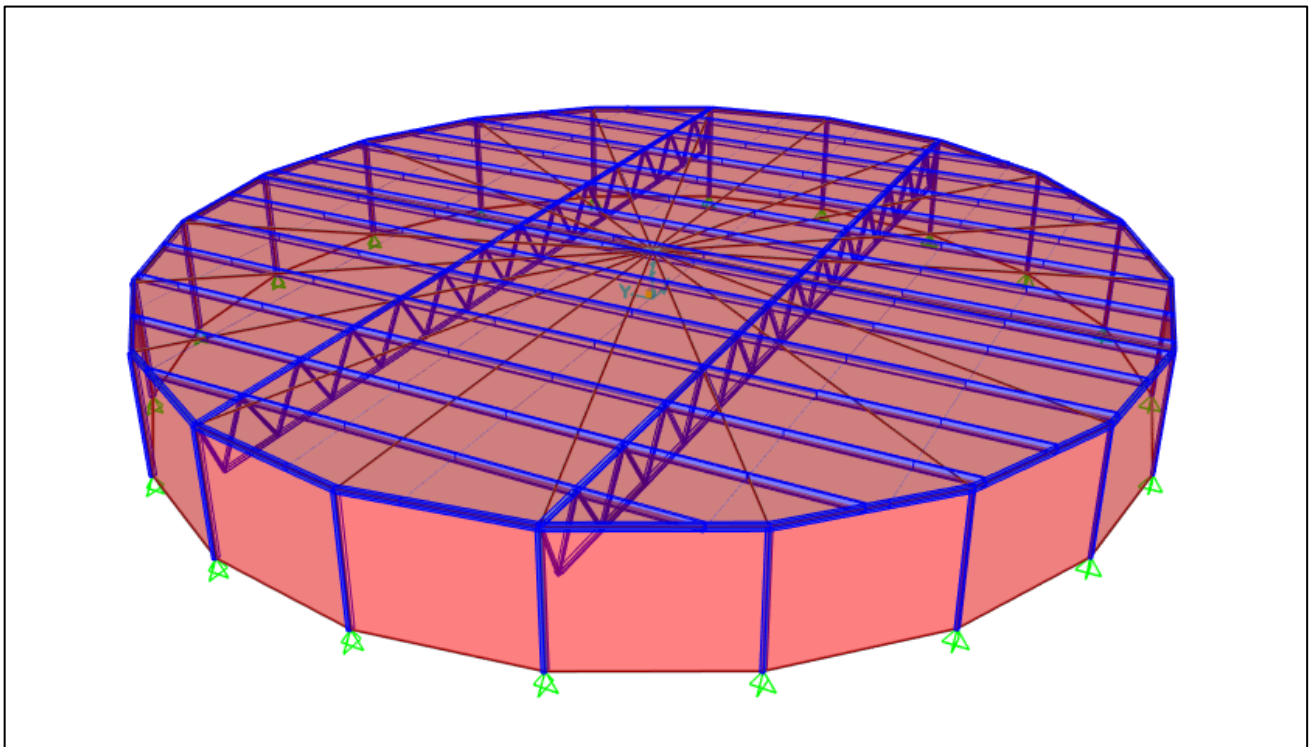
Finite Element Model of Ruakiwi Reservoir roof structure
